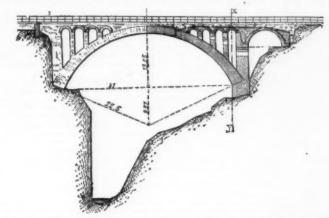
WALDLITOBEL VIADUCT.—LONGITUDINAL SECTION AND ELEVATION.
